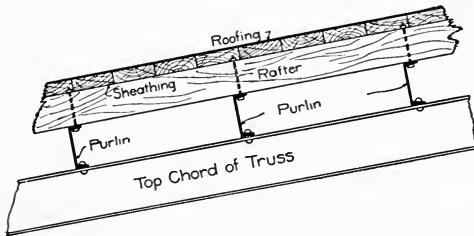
Roof Construction in which Rafters Supporting the Sheathing are Laid on the Purlins which Connect the Trusses.
